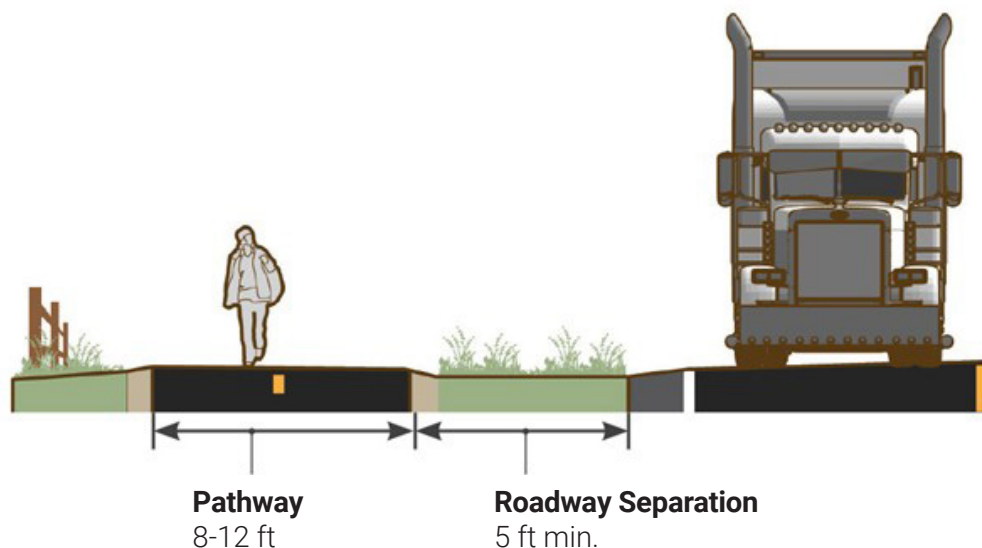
Typical sidepath section (Source: FHWA Small Town and Rural Multimodal Networks Guide)
